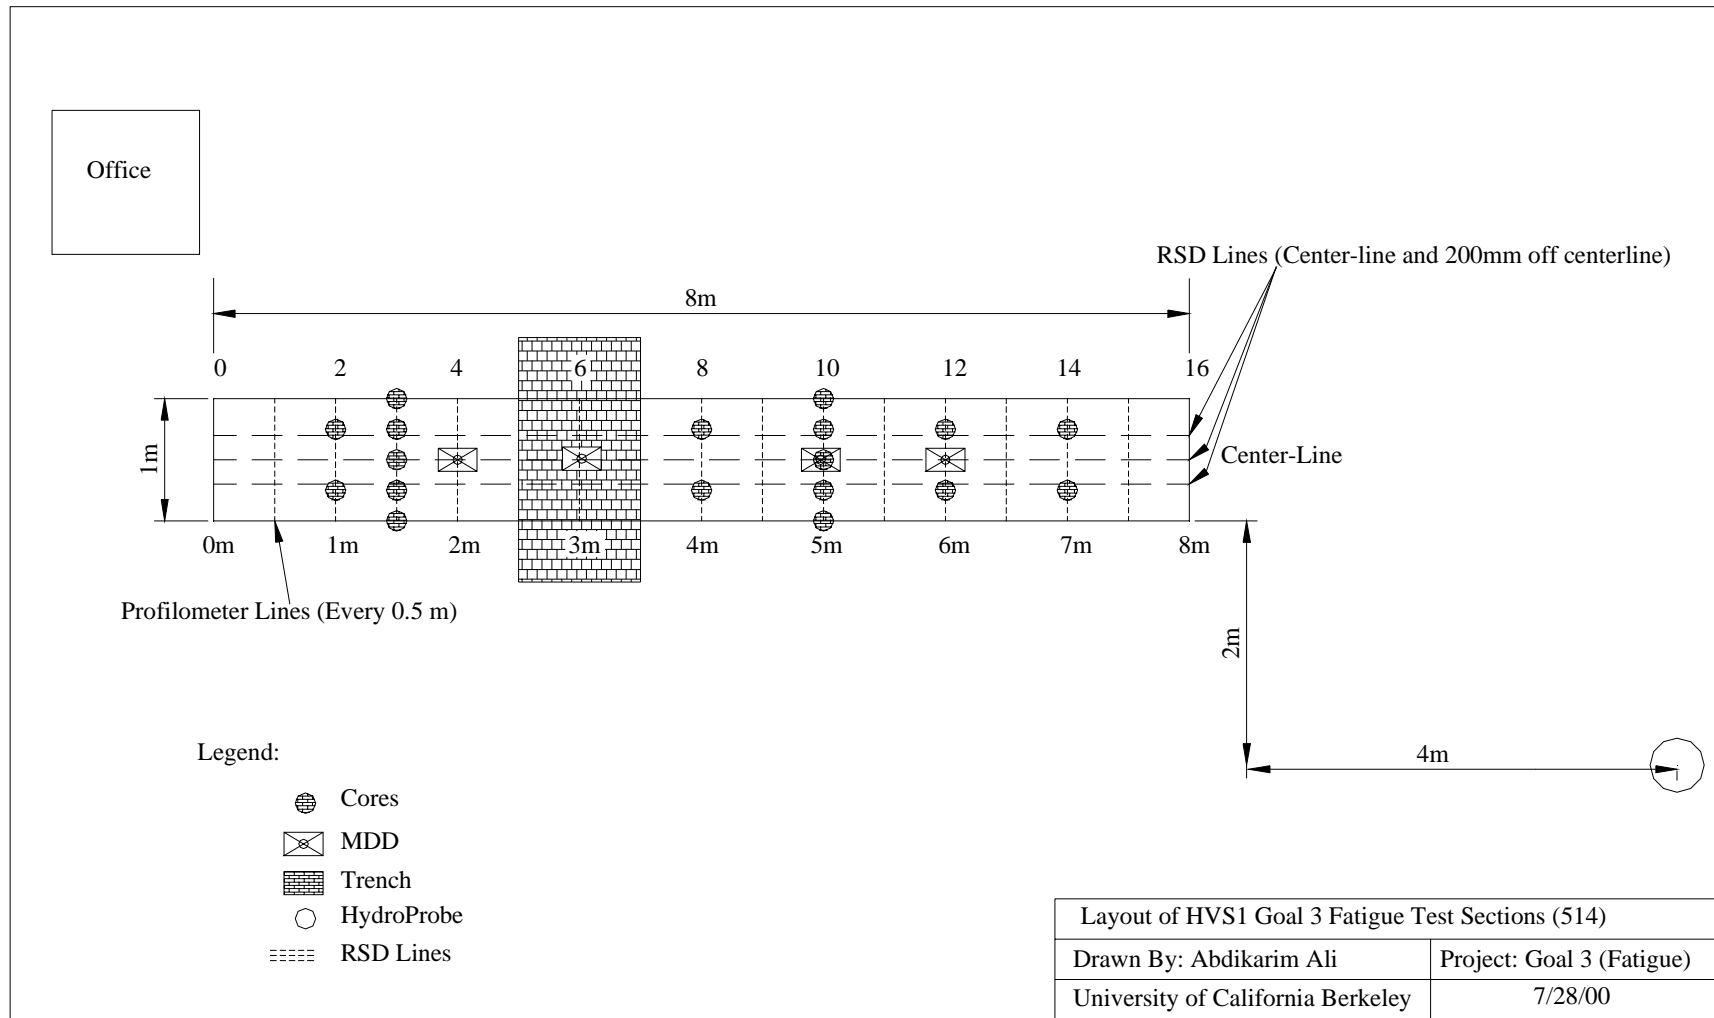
Locations of instrumentation, data collection points, and trenches and cores on Section 514 (drained, DGAC overlay).
